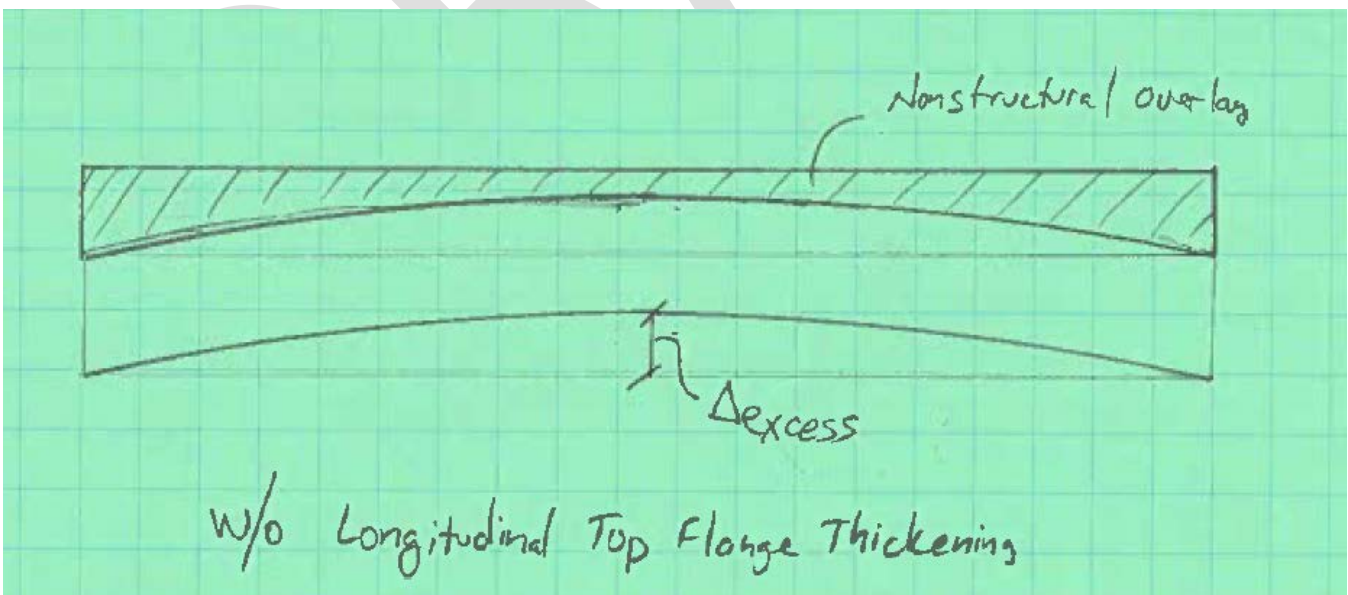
Nonstructural overlay without longitudinal top flange thickening
